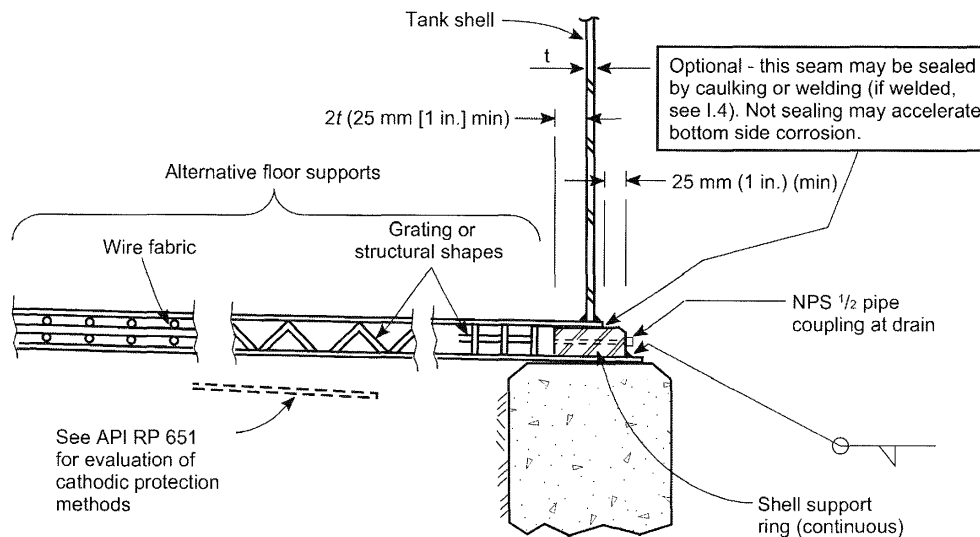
Double Steel Bottom with Leak Detection at the Tank Perimeter (Typical Arrangement)
